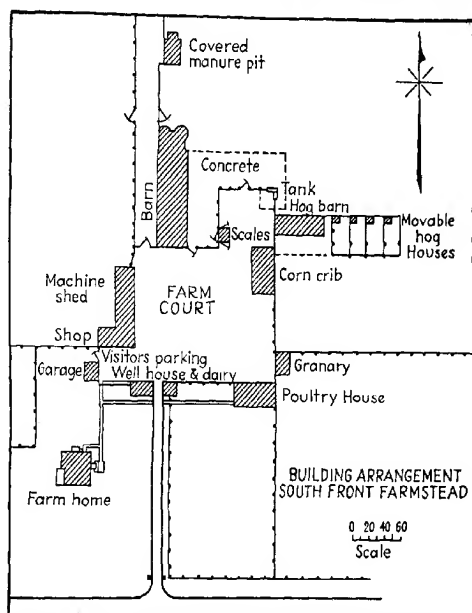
Skeleton plan showing buildings and walks of a farmstead. (*Successful Farming.*)
